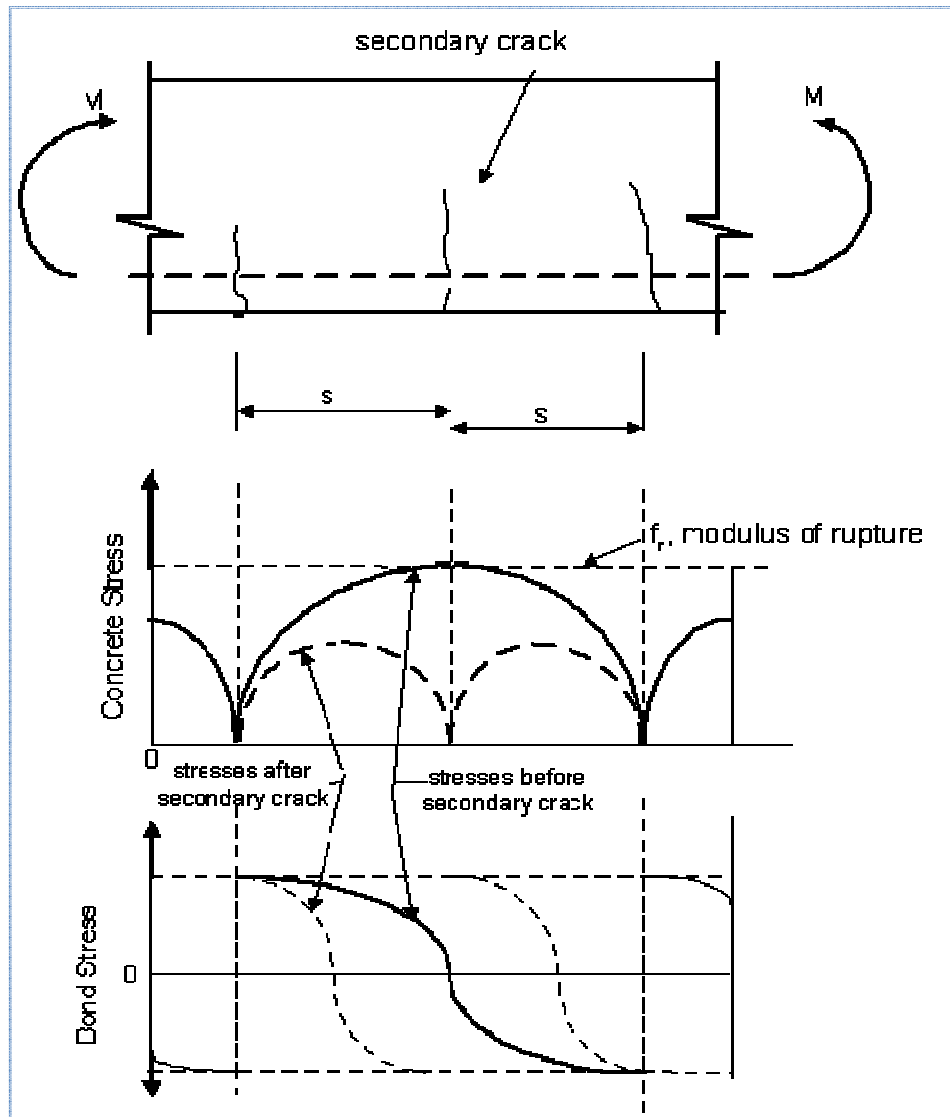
Concrete and Bond Stresses at Crack (Russell,1992).
